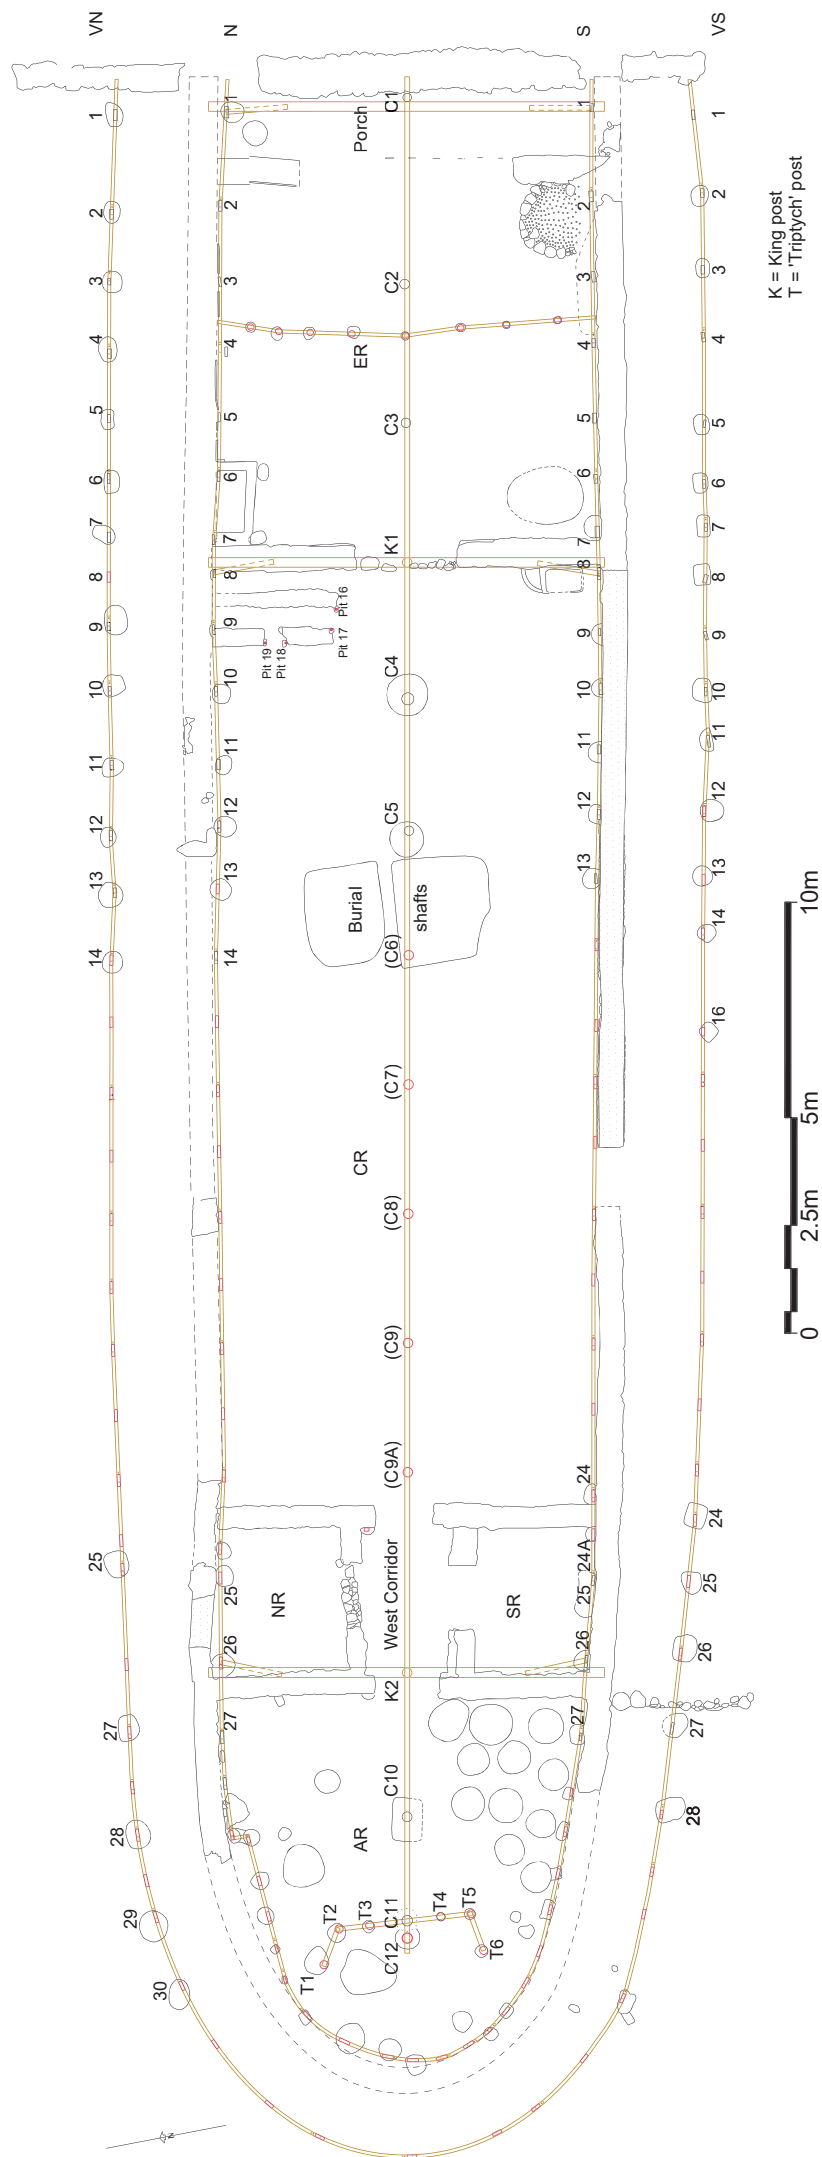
Reconstructed plan of the ridge beam(s), plates and crossbeams (in brown) superimposed on the existing plan (in black).
